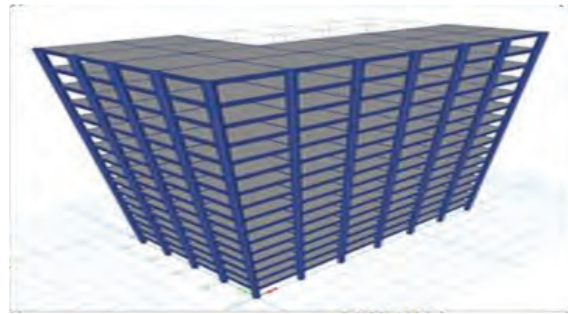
3D Model of G+15 L-Shaped Building with CFRP Circular Columns
